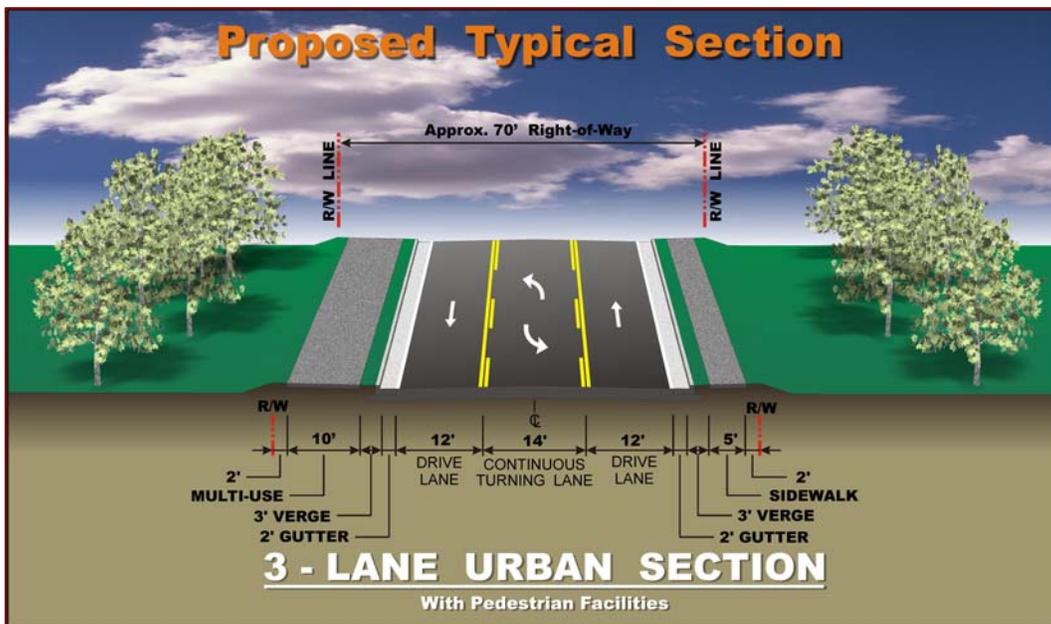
Analysis Section 1—Typical Section for Long-Term Reconstruction
